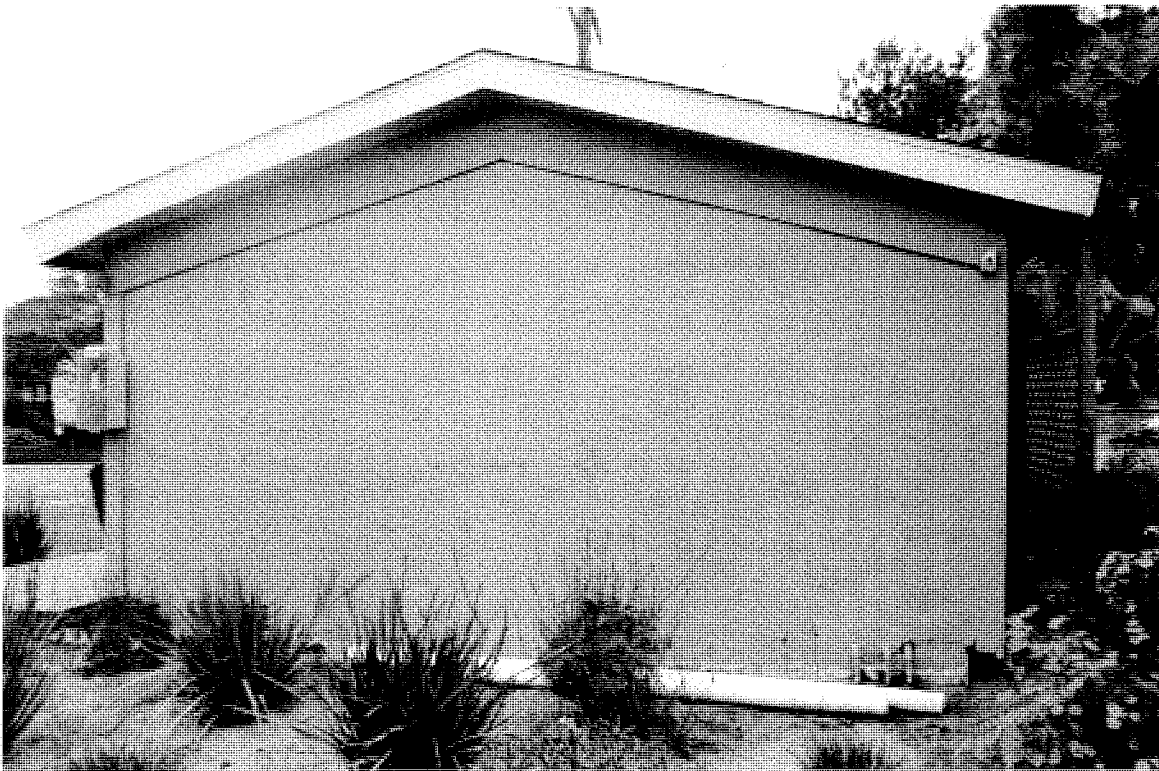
Looking north at south side elev. of unit 414, note foundation overhang at right, Nov., 2013.
